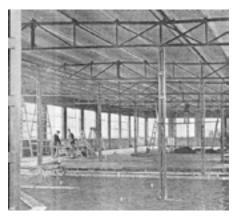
Building 12 under construction, illustrated in *Building*, May 1933
